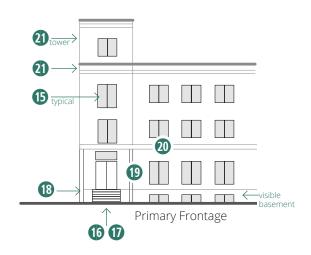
E-3. General Building: Facade Design Requirements
